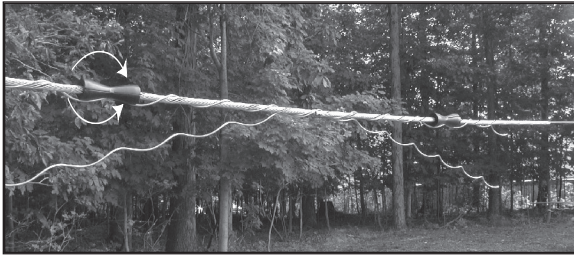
MOVE ROD AROUND INSERT UNTIL ROD FITS CONTOUR
